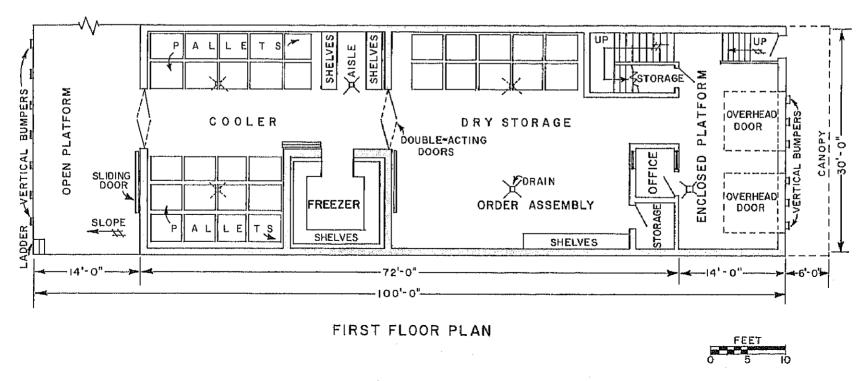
A layout for a manufactured dairy products wholesale firm.
